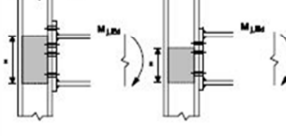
Modeling of a welded joint with the component method
